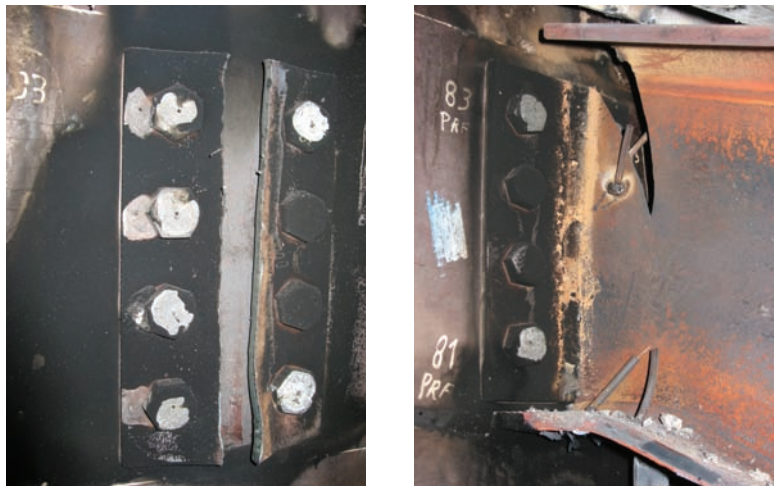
(a) End plate failure (joint Z2); (b) beam failure (joint Z3) at test HJ01.
